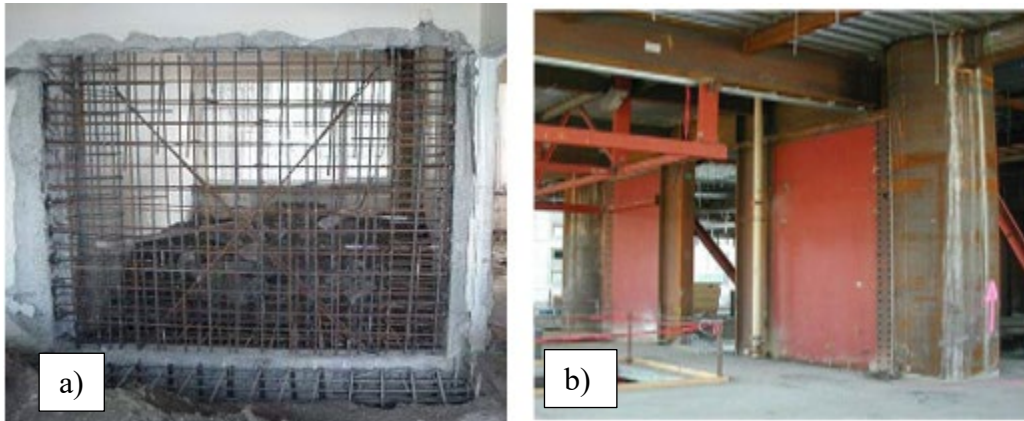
Adding a) concrete b) steel shear walls as retrofit technique
